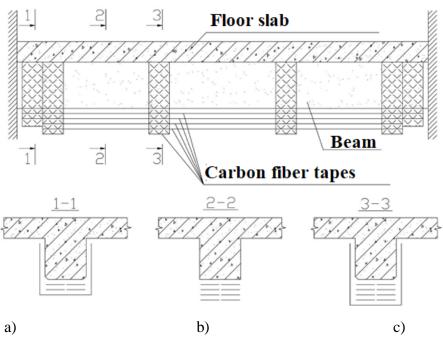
Scheme of beam reinforcement: a near-support zone, b span, c periodic anchoring of longitudinal strips.
